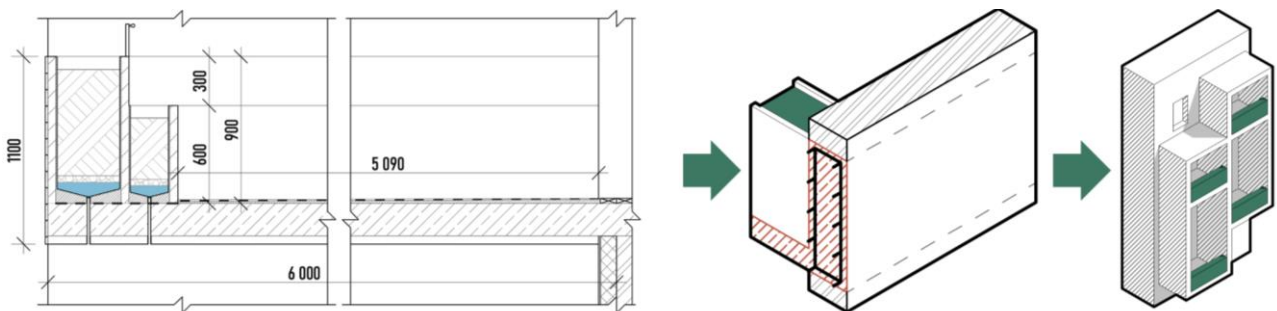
Cantilever construction of an agrarian element with lateral bearing beams [author's development]
